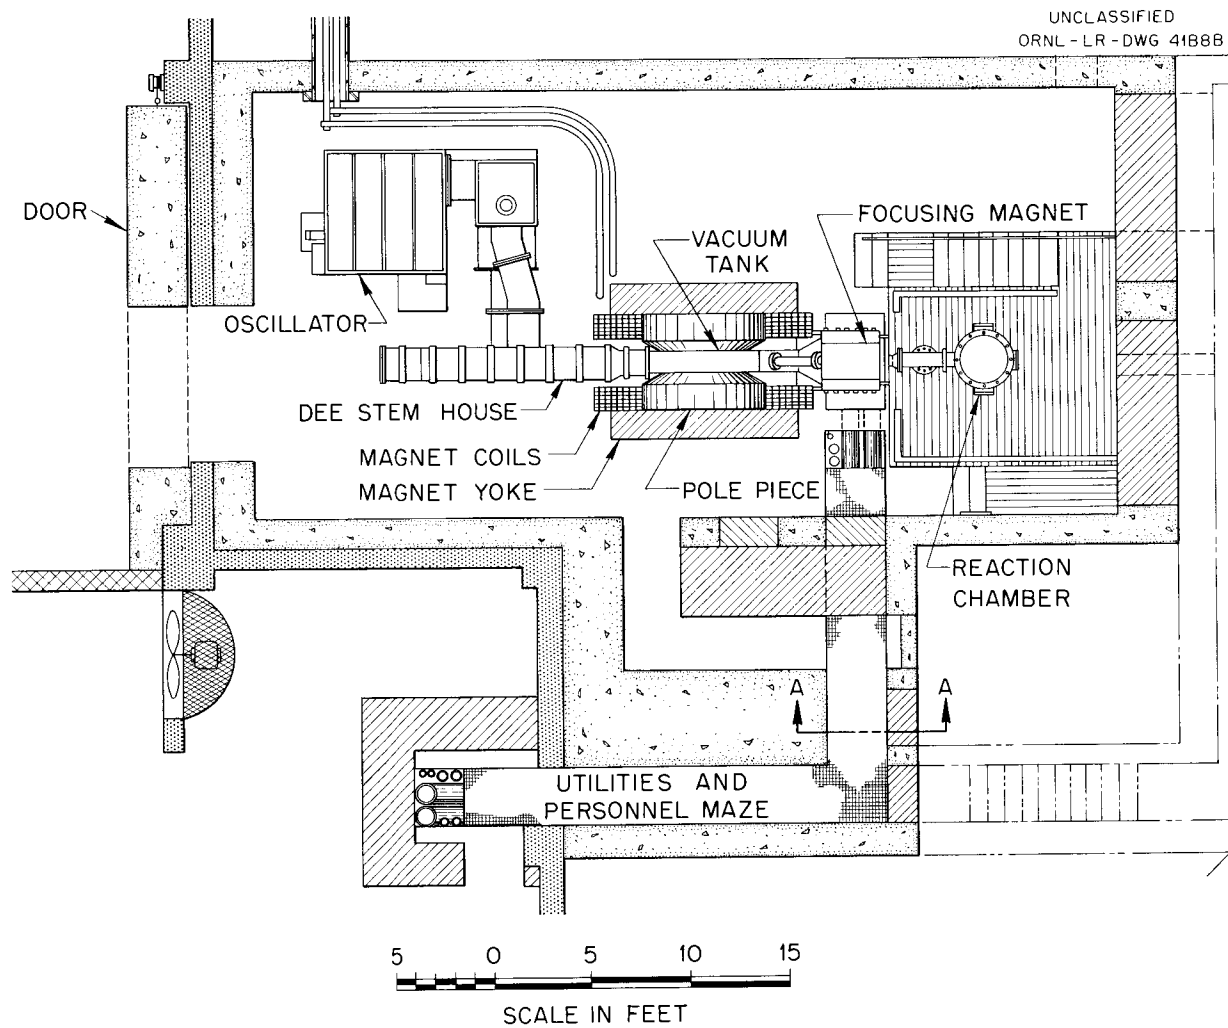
Plan View of Cyclotron Installed in Shielded Room, Adjacent to Building 9204-3.
